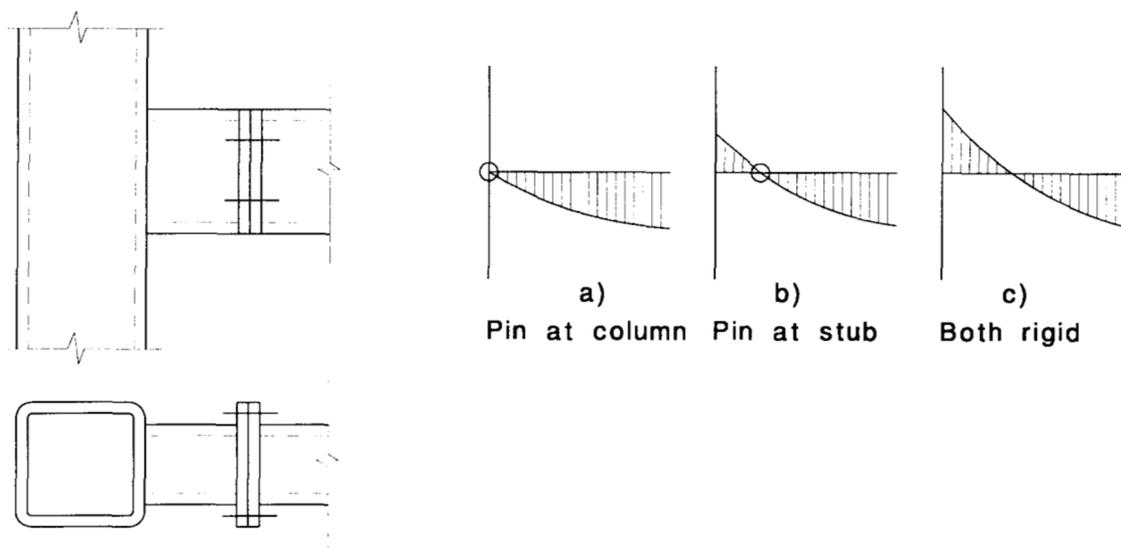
Connection between hollow sections, with alternative bending moment diagrams
